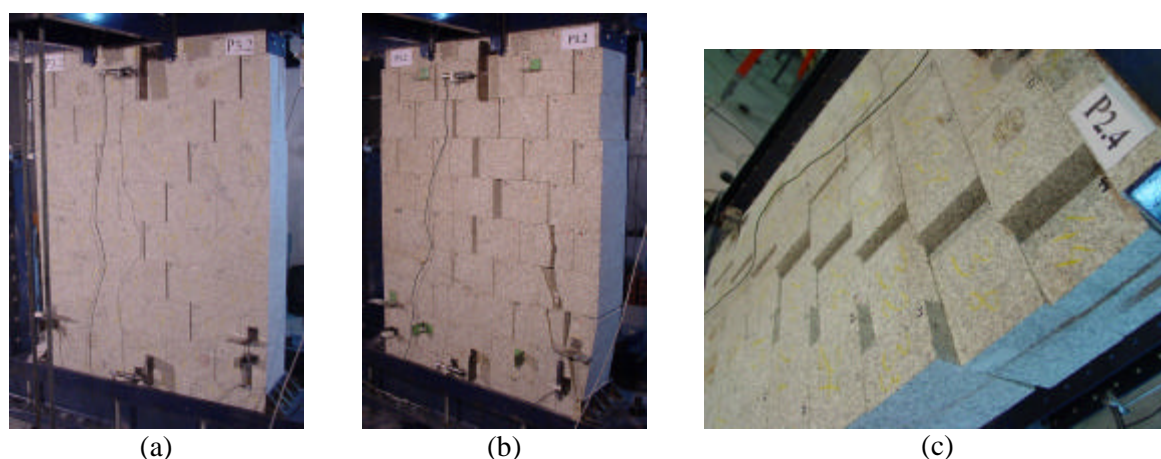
Typical failure patterns of dry masonry walls at the end testing; (a) horizontal residual displacements in wall WS1.175; (b) toe crushing and wedge formation in the wall WS2.250; (c) out-of-plane displacement of units in wall WS4.100
